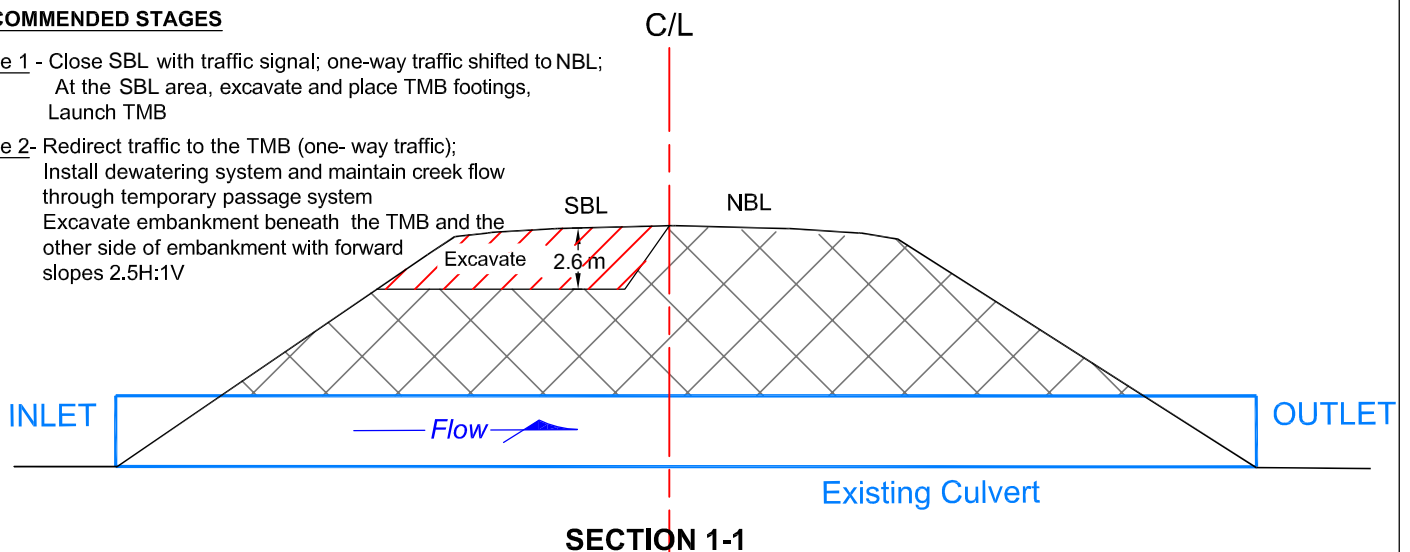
STAGED CONSTRUCTION WITH TEMPORARY MODULAR BRIDGE
